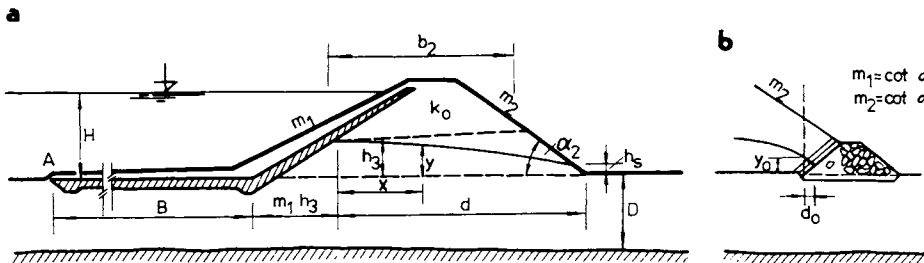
Cross-section of a dam with sealing blanket. a — without drainage, b — with gravel toe drainage.
